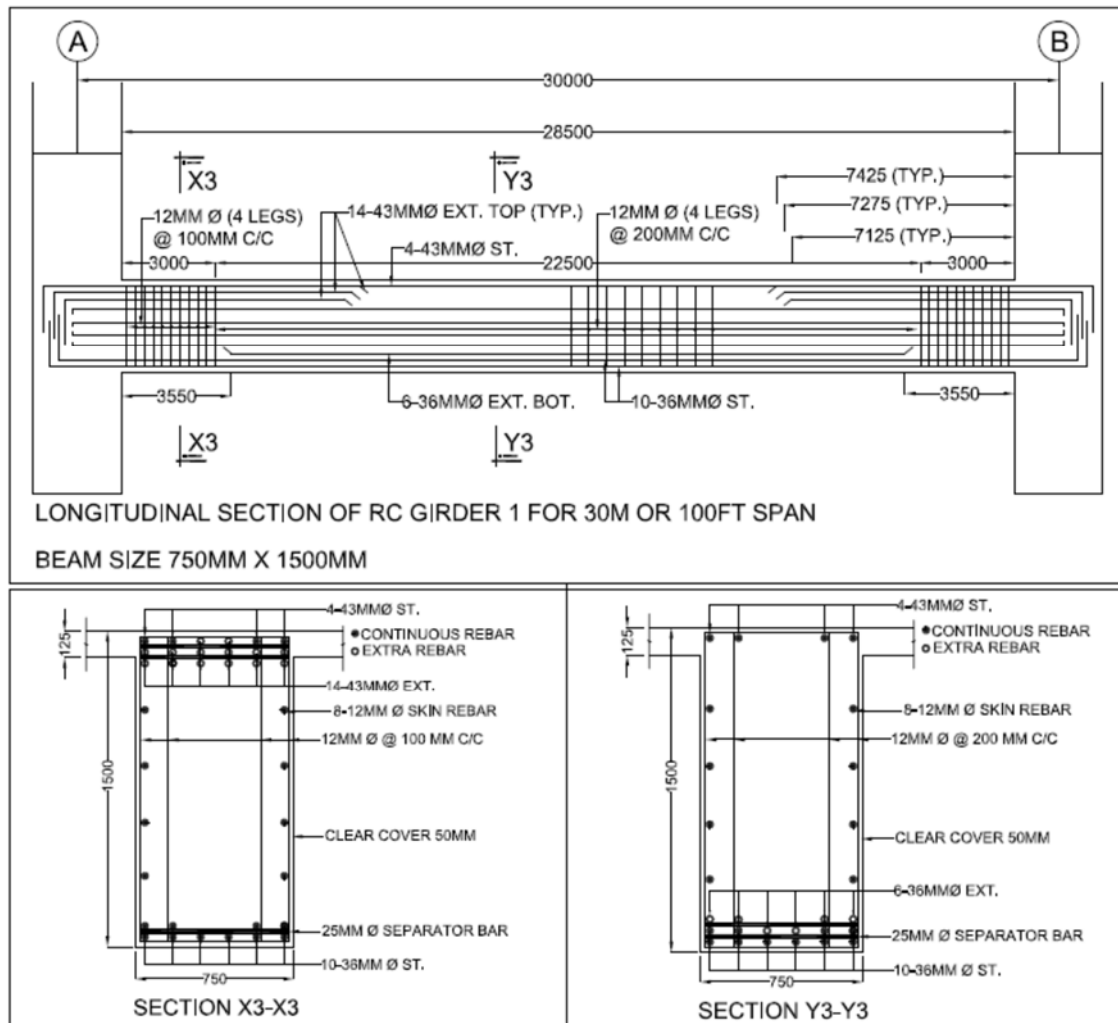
Reinforcement detail of RC beam for 30m (100ft) span.
